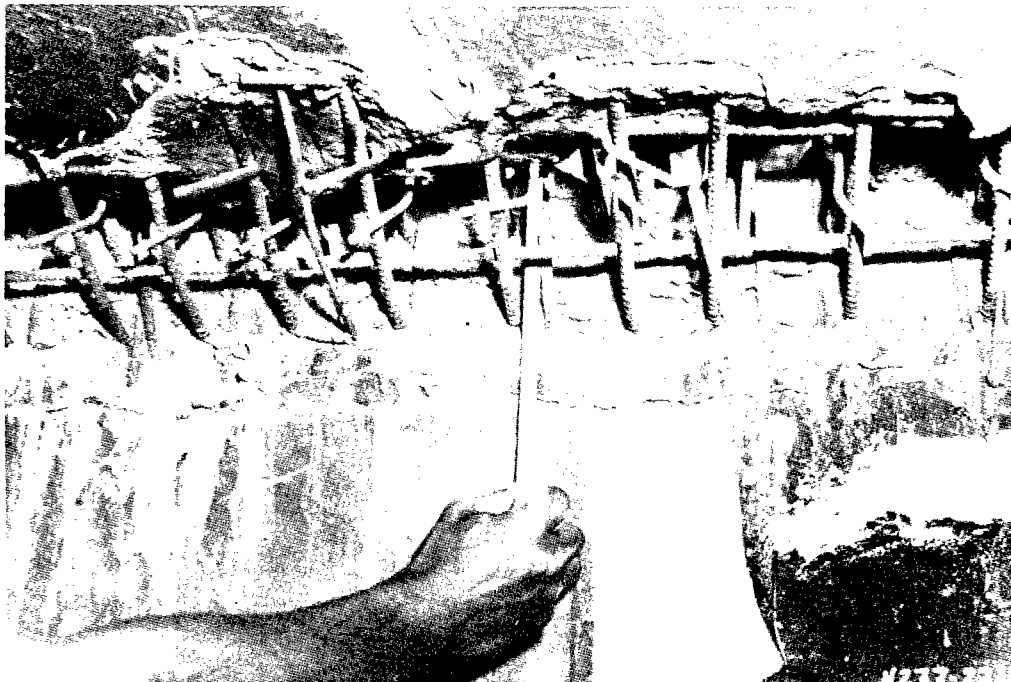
Interior view of roof edge following sealant and loose concrete removed after Test 2
